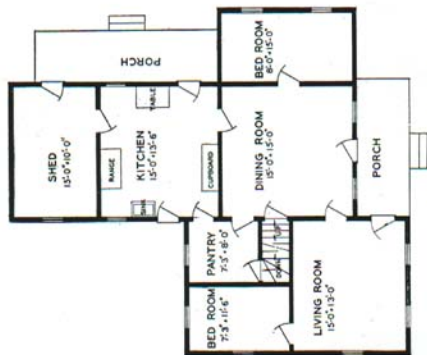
Original house plan. Note the poorly arranged kitchen.
